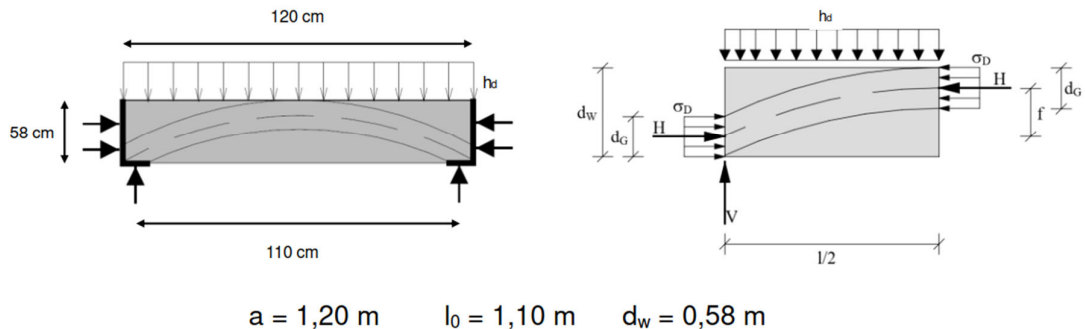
Stresses acting on the unreinforced concrete are transmitted by compression arch.
